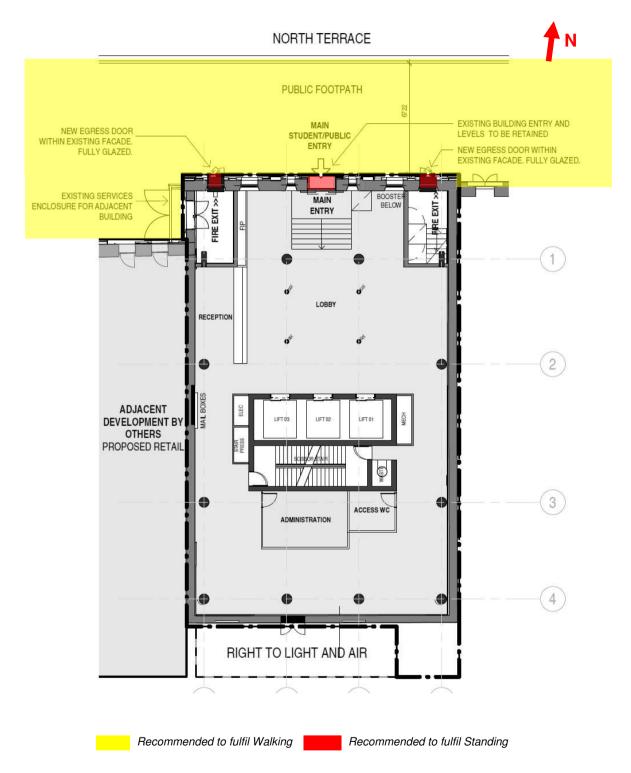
Ground level Plan view of the proposed development with recommended wind criteria overlaid
